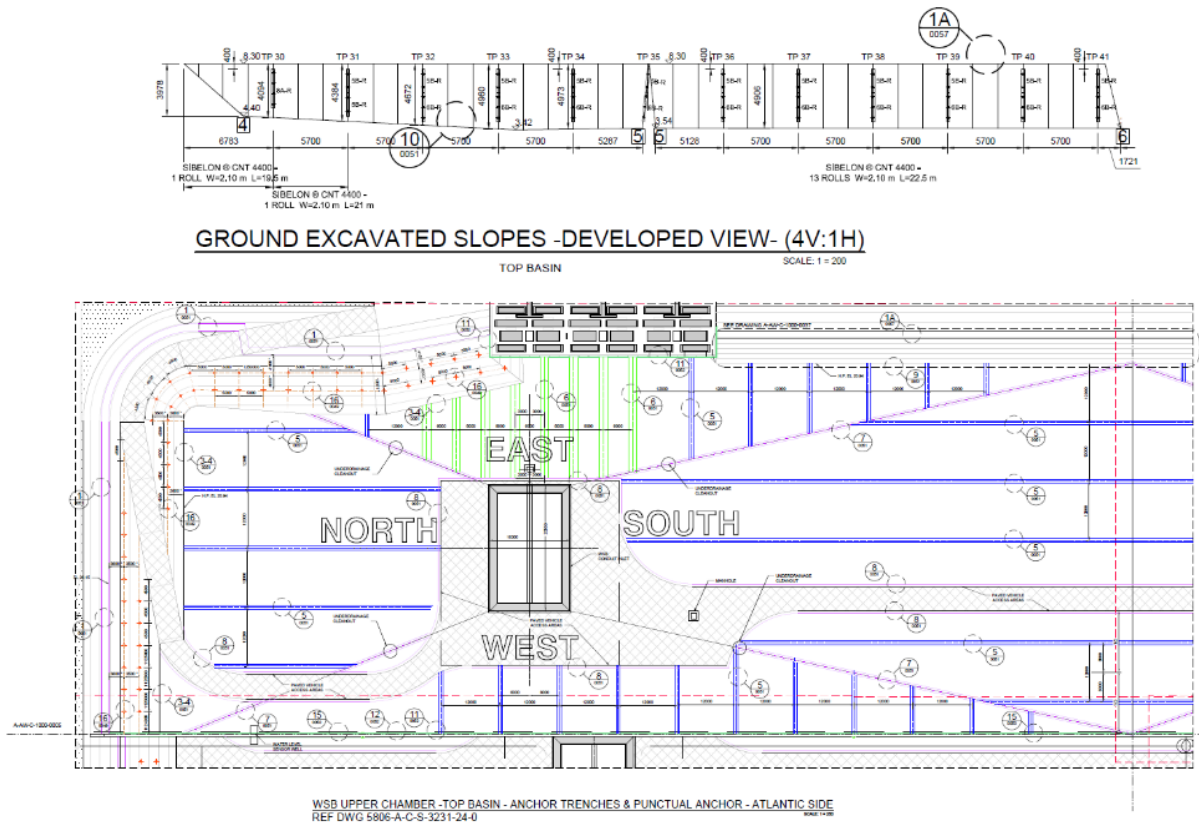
General View plan of a basin with location of trenches, deep anchors, and typical distribution of tensioning profiles
